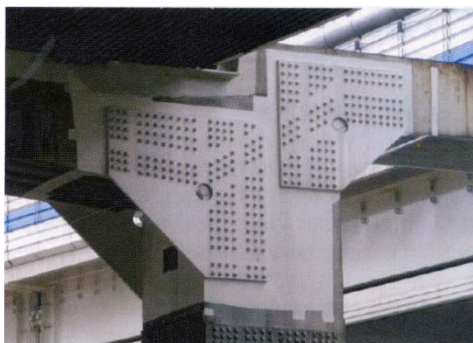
Fatigue crack in rigid frame type piers¹⁾
